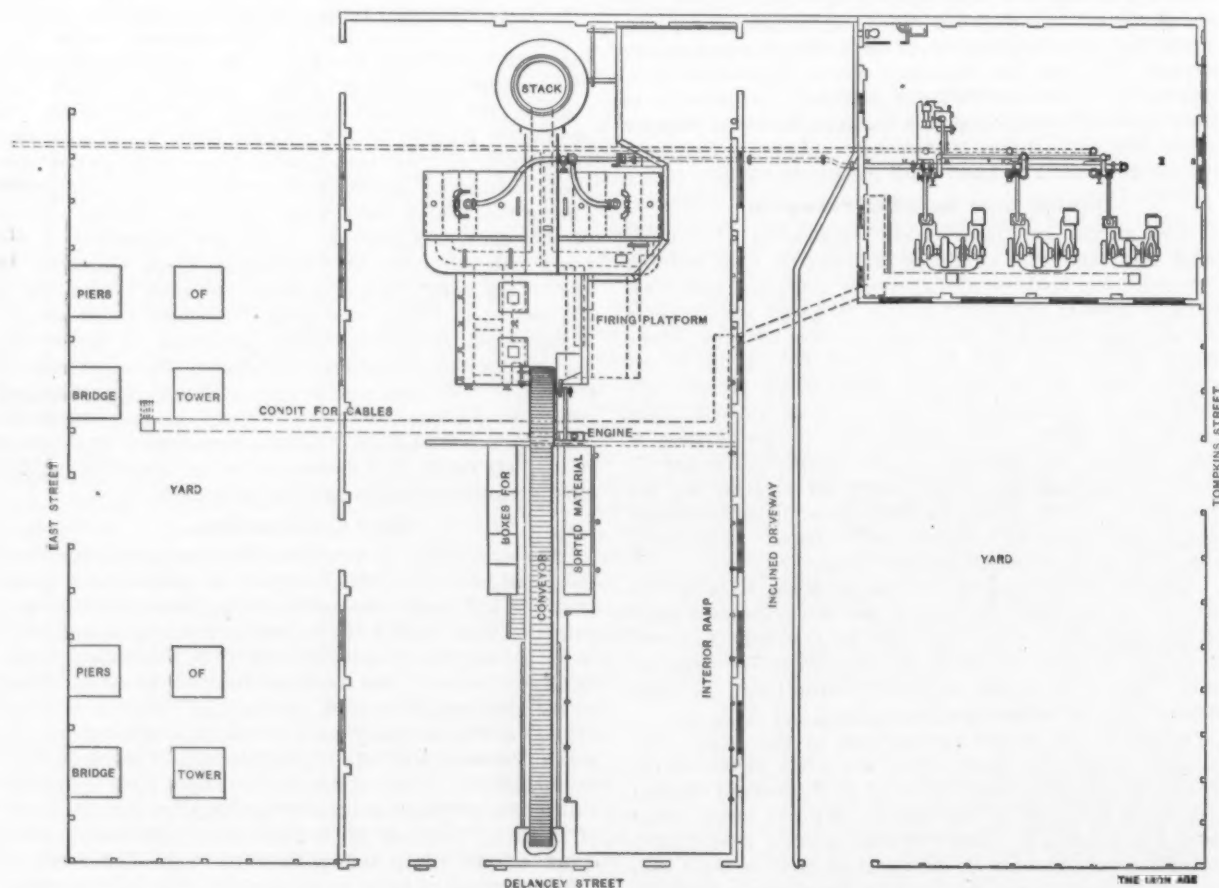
Plan of the New York Rubbish Incinerating Plant.
